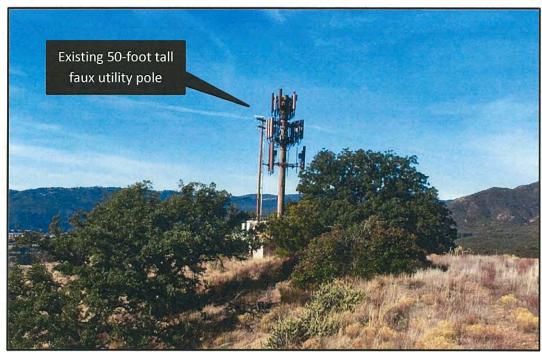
Existing 50-foot tall faux utility pole with equipment enclosure.
